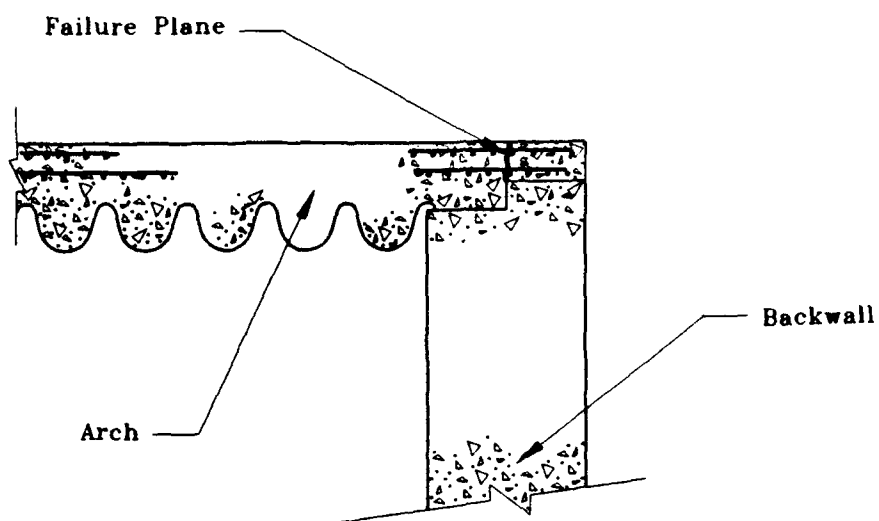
Section: Failure plane between arch and backwall, PAS-4.
